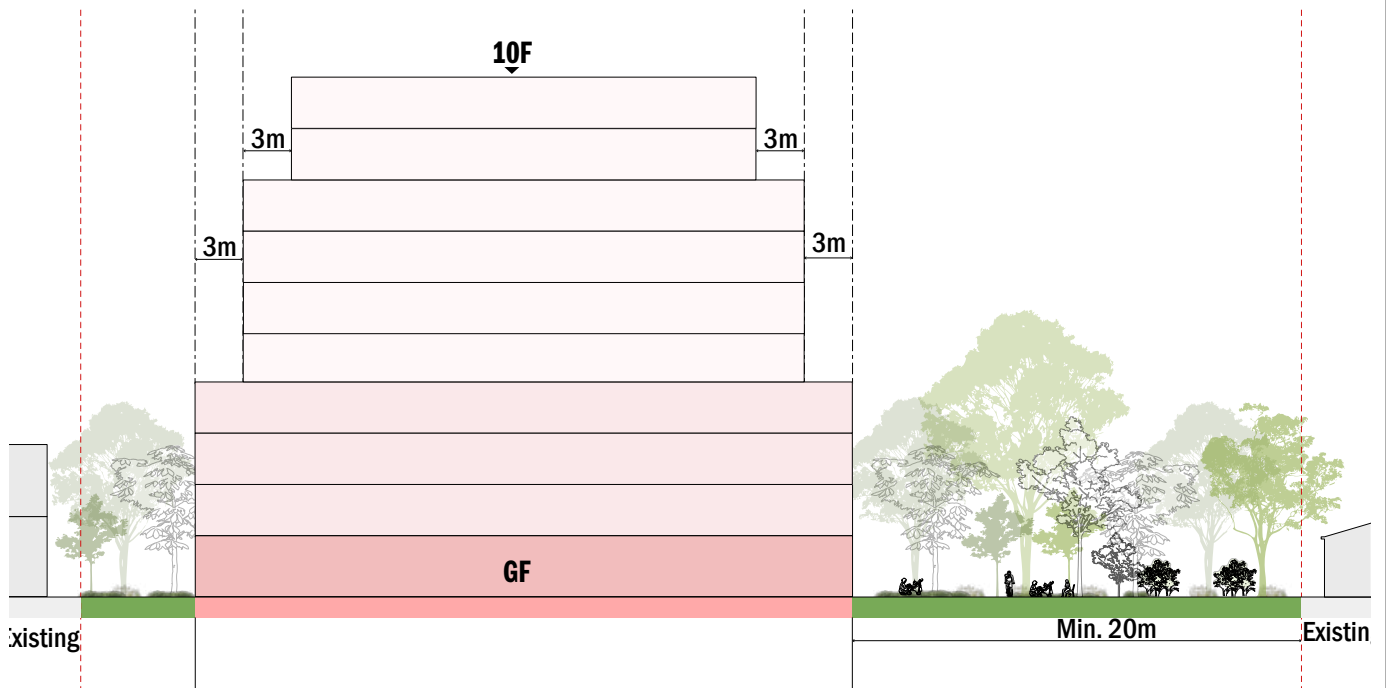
Section 3 - Opportunity site at 40 Charlotte Street
